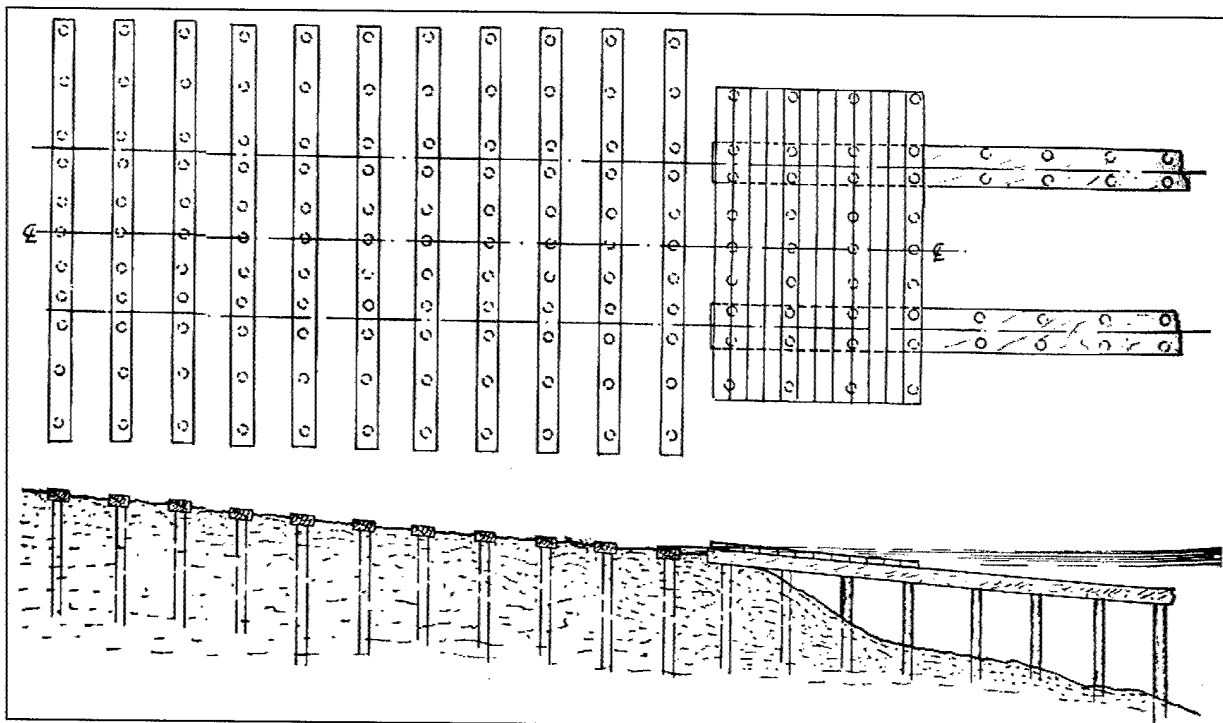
Profile and plan view of a building slip and launching way. Although constructed of wood and not of brick, the components for the railway would be similar. Note how the supports are located both on land and extend into deep water (as presented in Desmond 1984:66).
